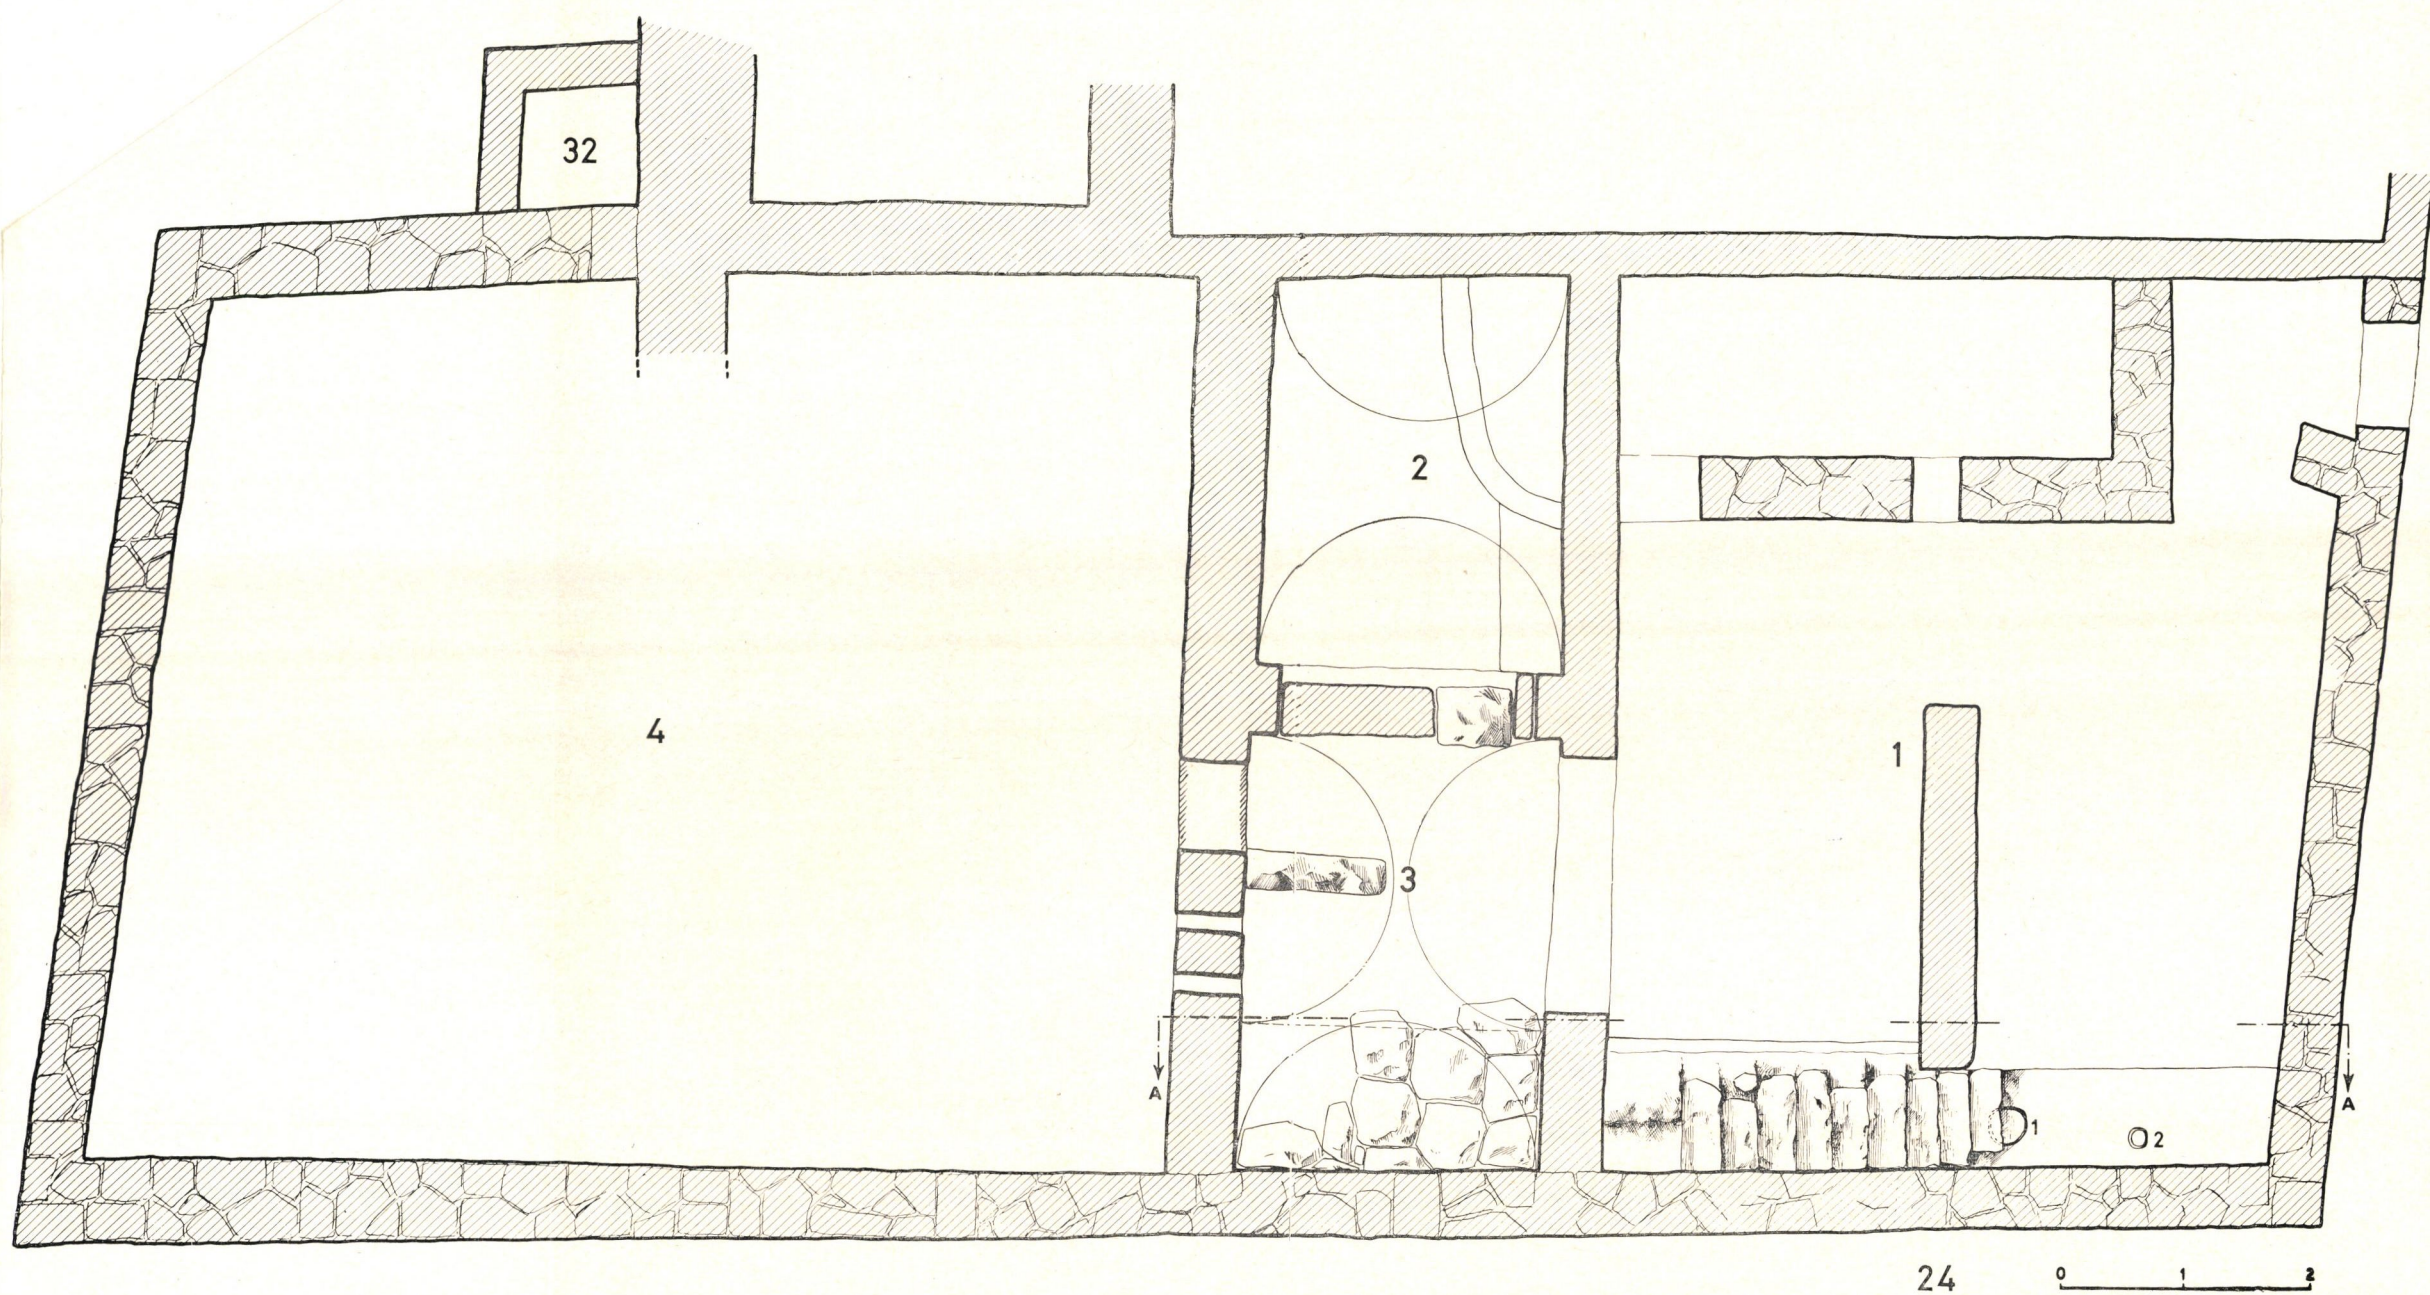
C/III, ground-plan of the stone tower with rooms Nos 1-4
